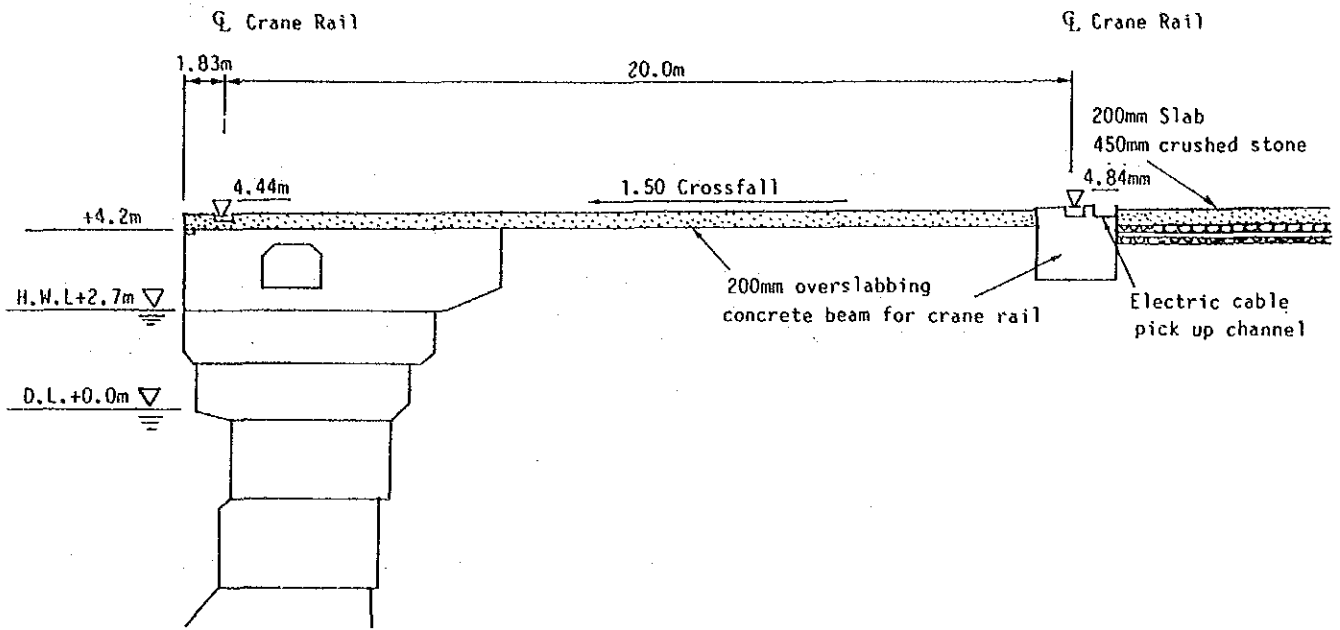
Standard Cross Section of the Crane Foundation
